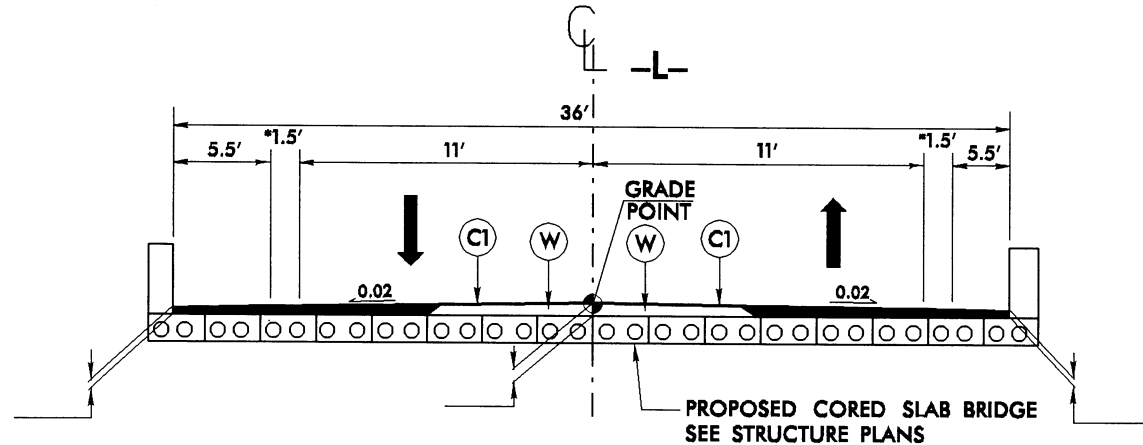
DETAIL SHOWING METHOD OF WEDGING ON BRIDGE
